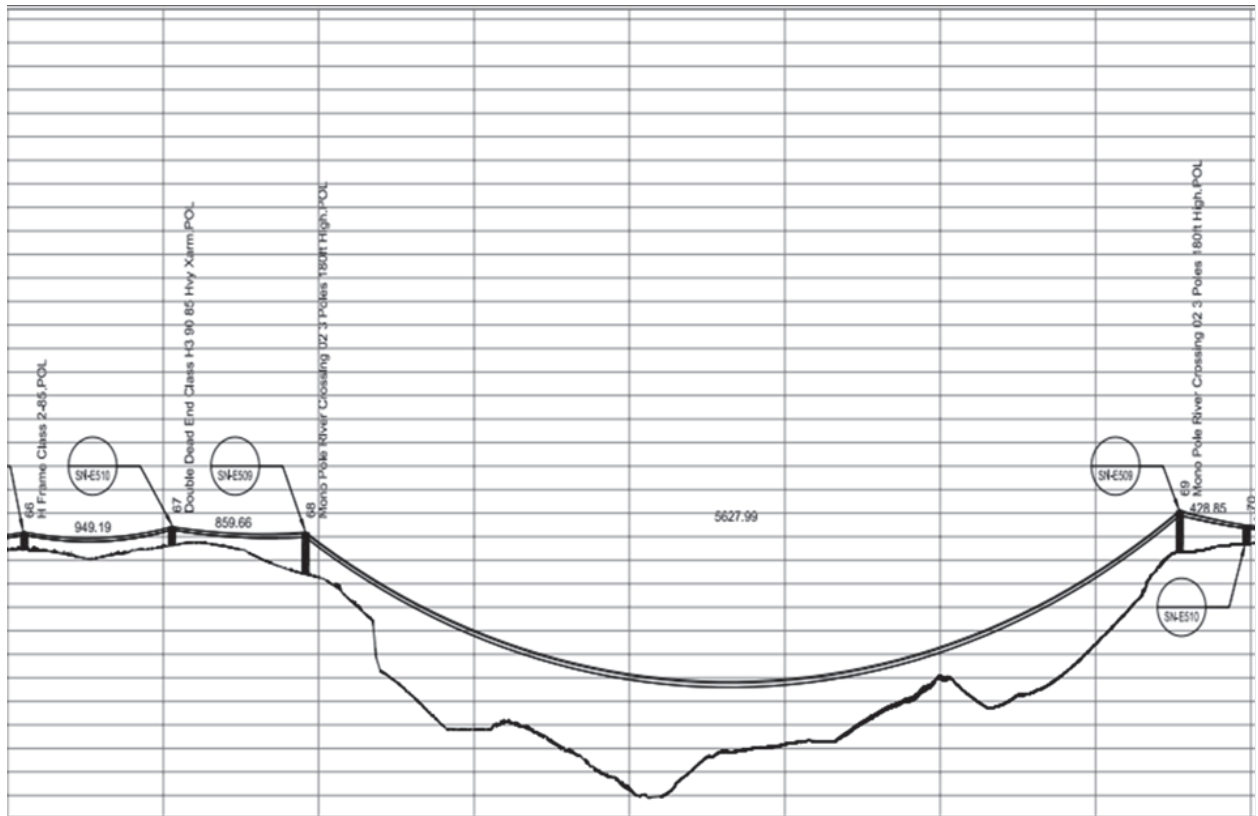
Cross section of planned river crossing and pole structure at canyon rim
